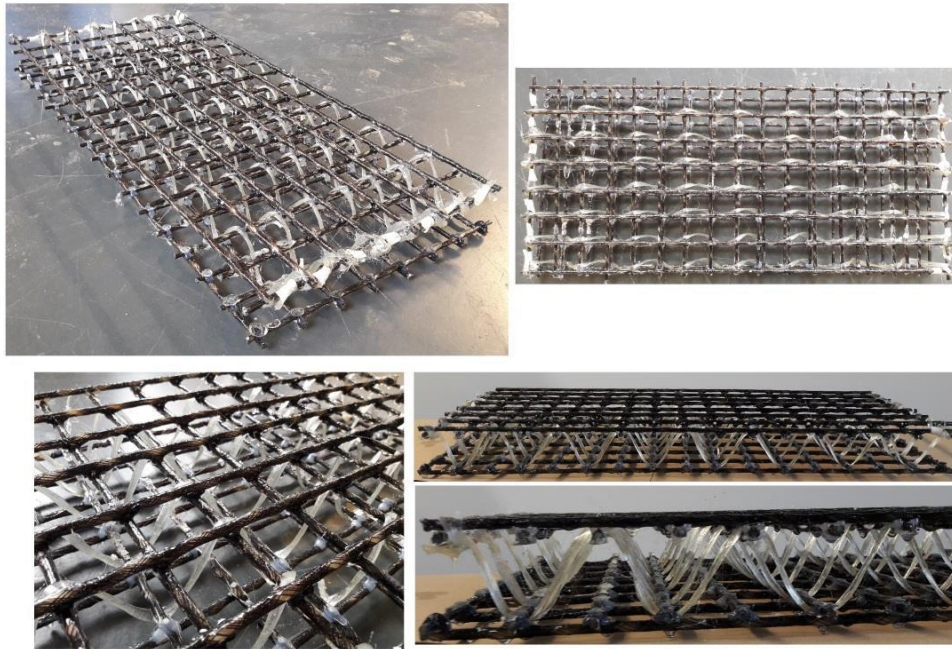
Samples of 3D-SRT reinforcement for slabs [17].
